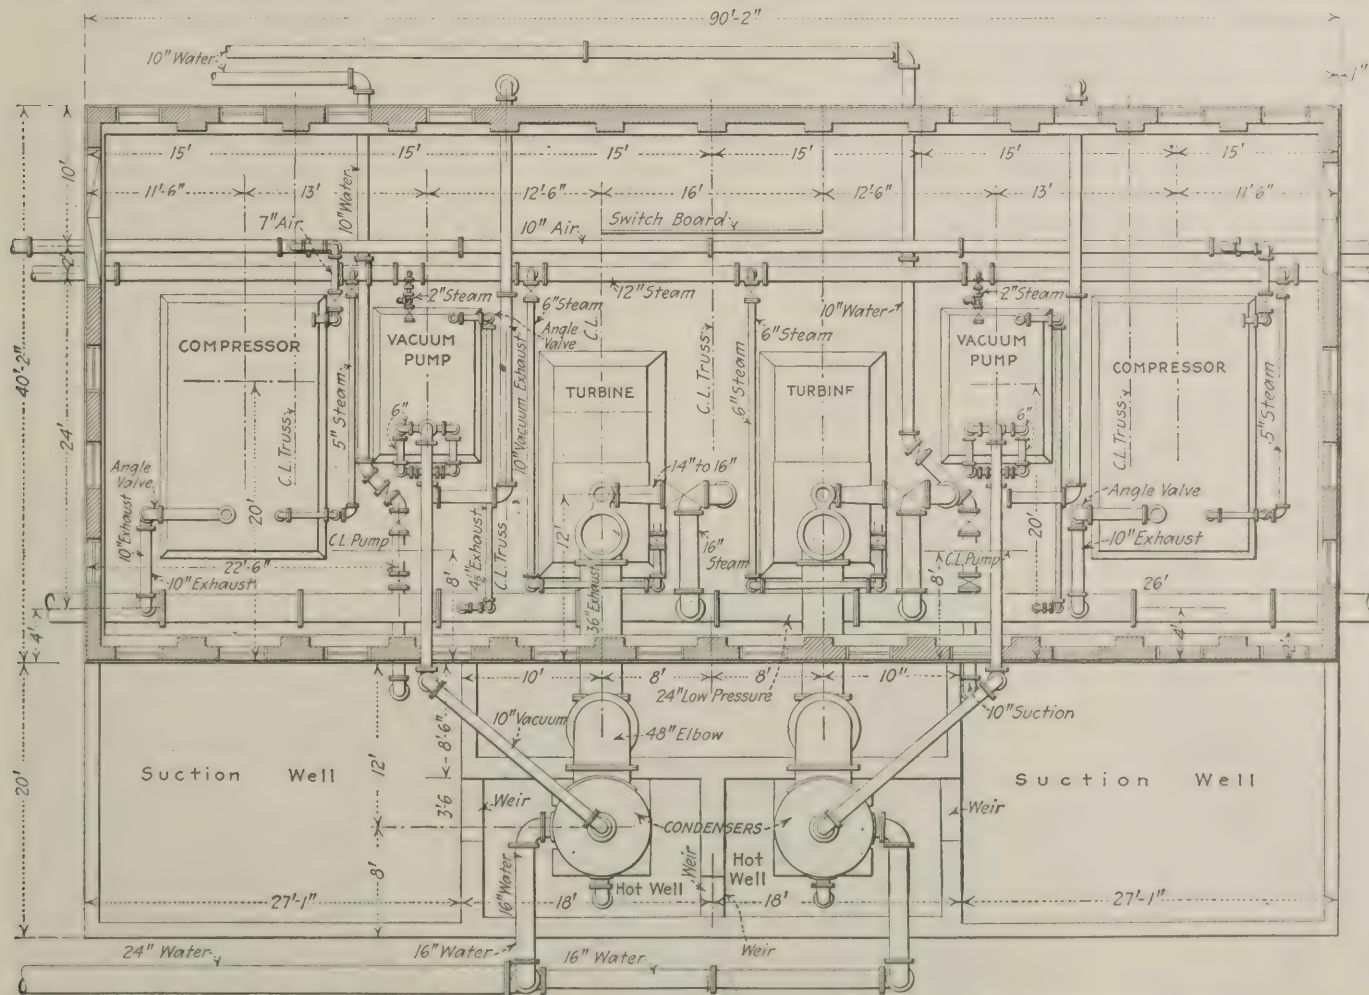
PLAN OF THE PRICE-PANCOAST POWER HOUSE, SHOWING ARRANGEMENT OF MACHINERY
